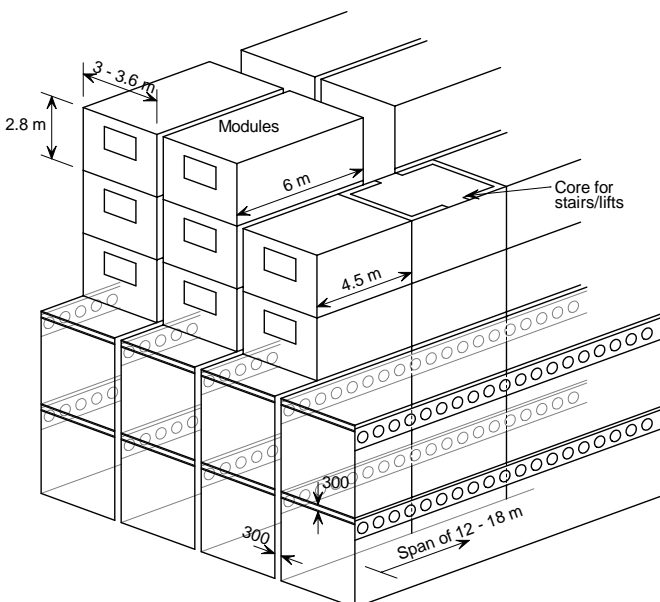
Modules supported by long spanning cellular beams to create open plan space at the lower levels
